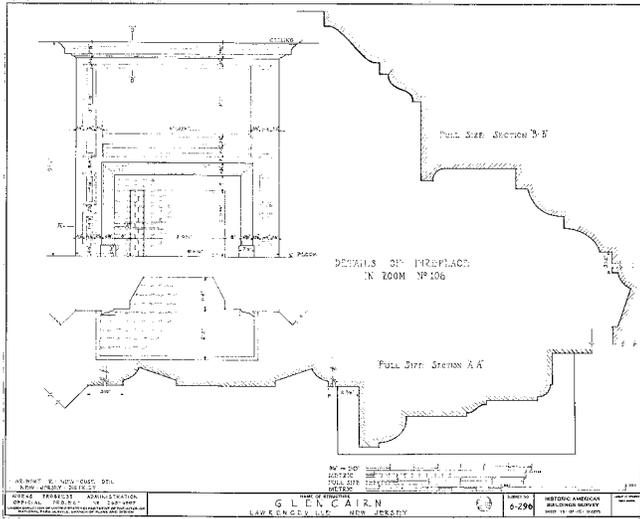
Glencairn Frame Wing First Floor Northwest Room, 1936—HABS
